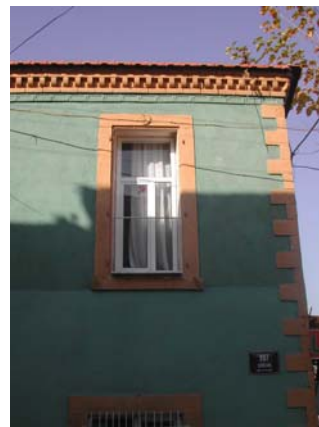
Perforated eave cornice consisting of straight bricks called Sakız (397th Street No. 29)
